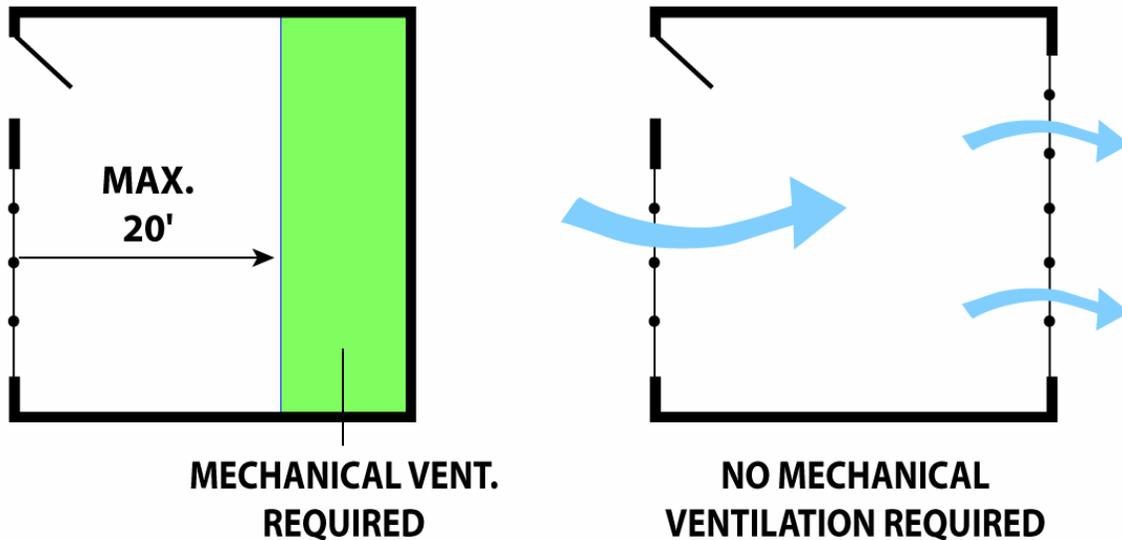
Mechanical Ventilation Requirement for Typical Classroom Space
